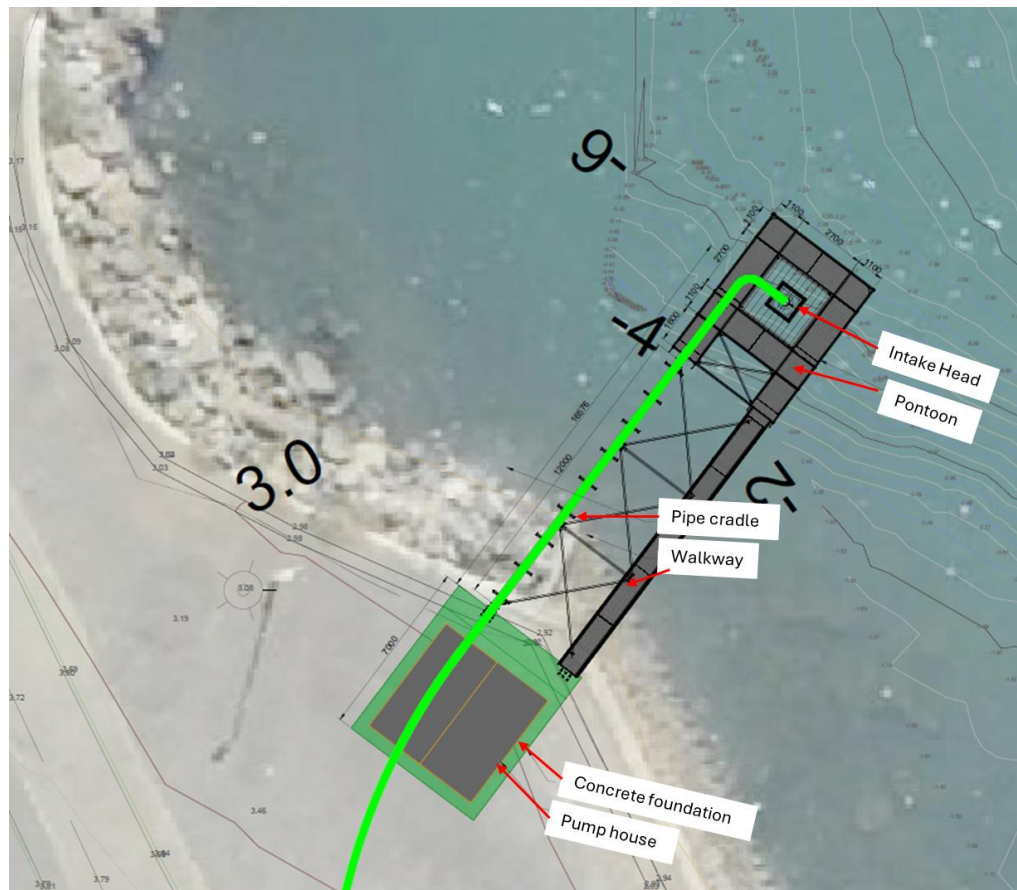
Draft pontoon system, pump house on concrete foundation and intake pipeline (bright green).
